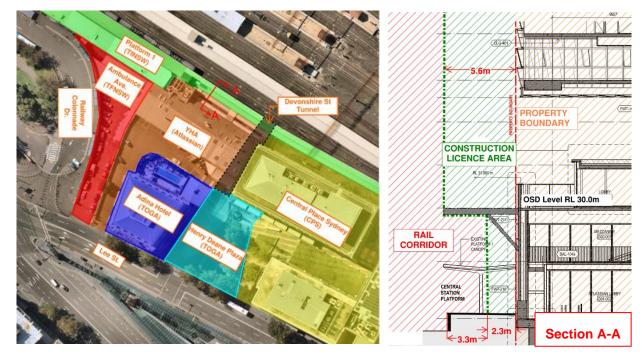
Site location plan & section illustrating proposed development & surrounding properties
